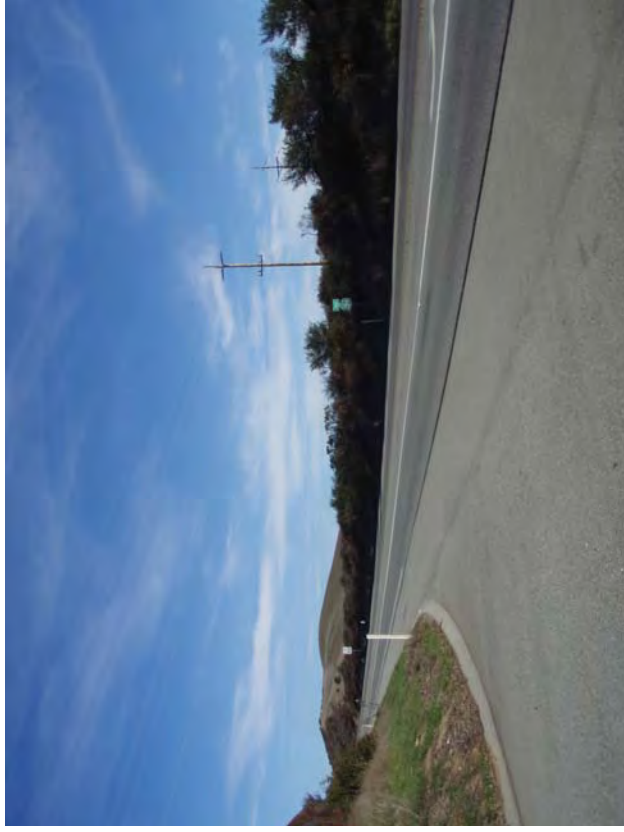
View of State Route 156 at Buena Vista Road looking northeast
